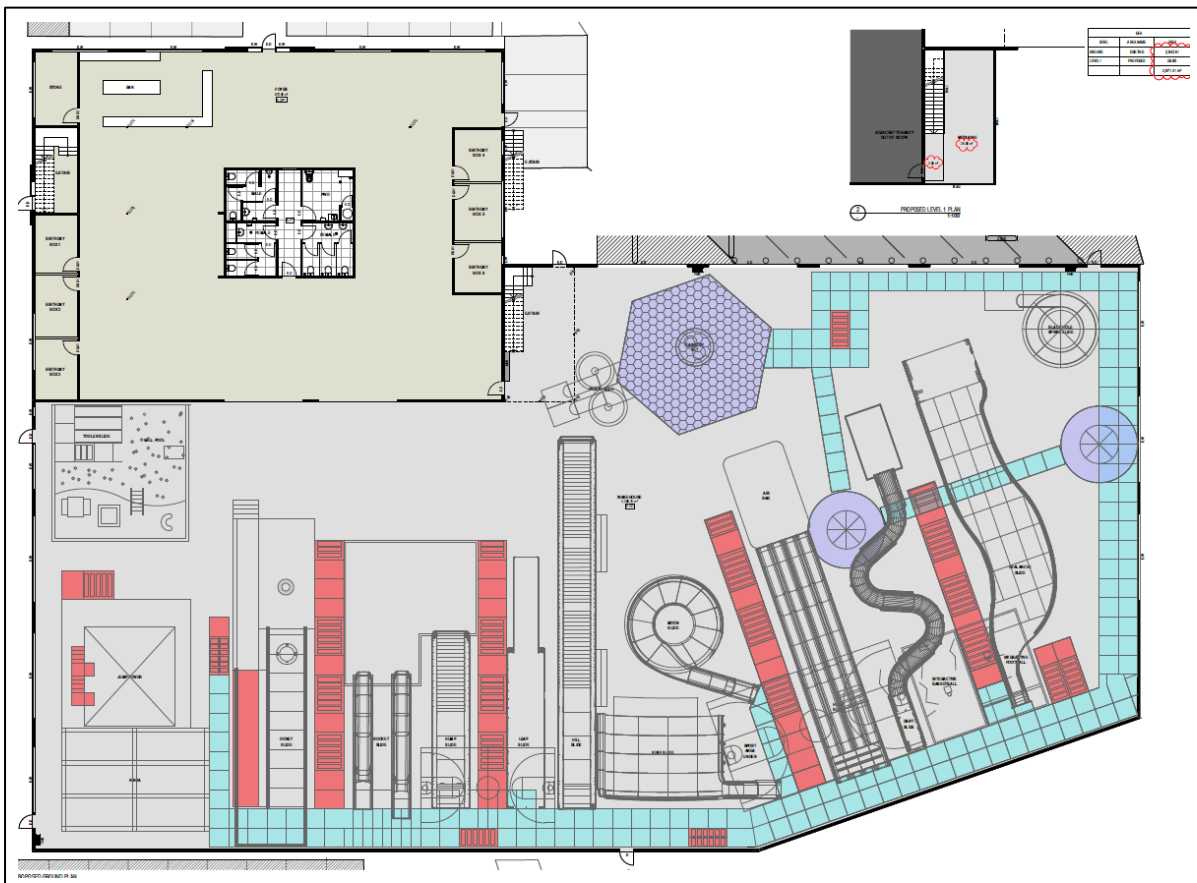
Proposed floor plan (Source: Base Architecture, 2026)
